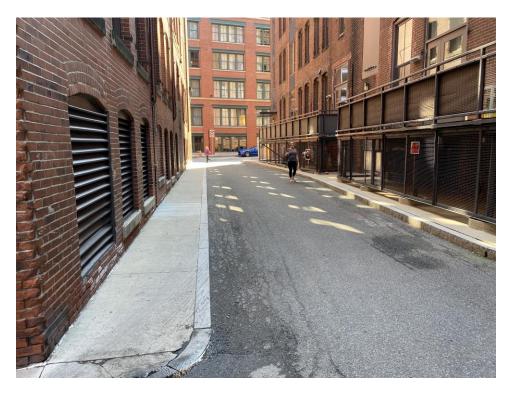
Transformer pad and electrical equipment in private alley way behind building.
